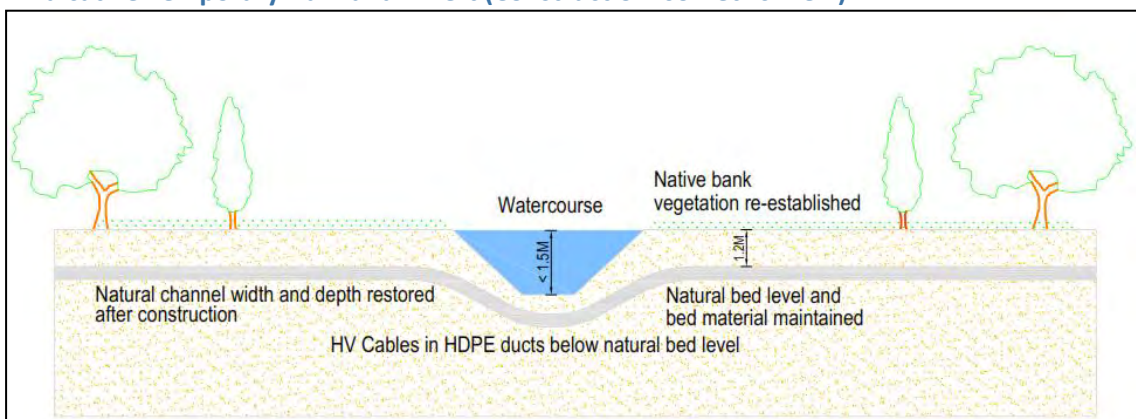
Indicative Temporary Dam and Divert (Post-Installation Cross-Sectional View)
